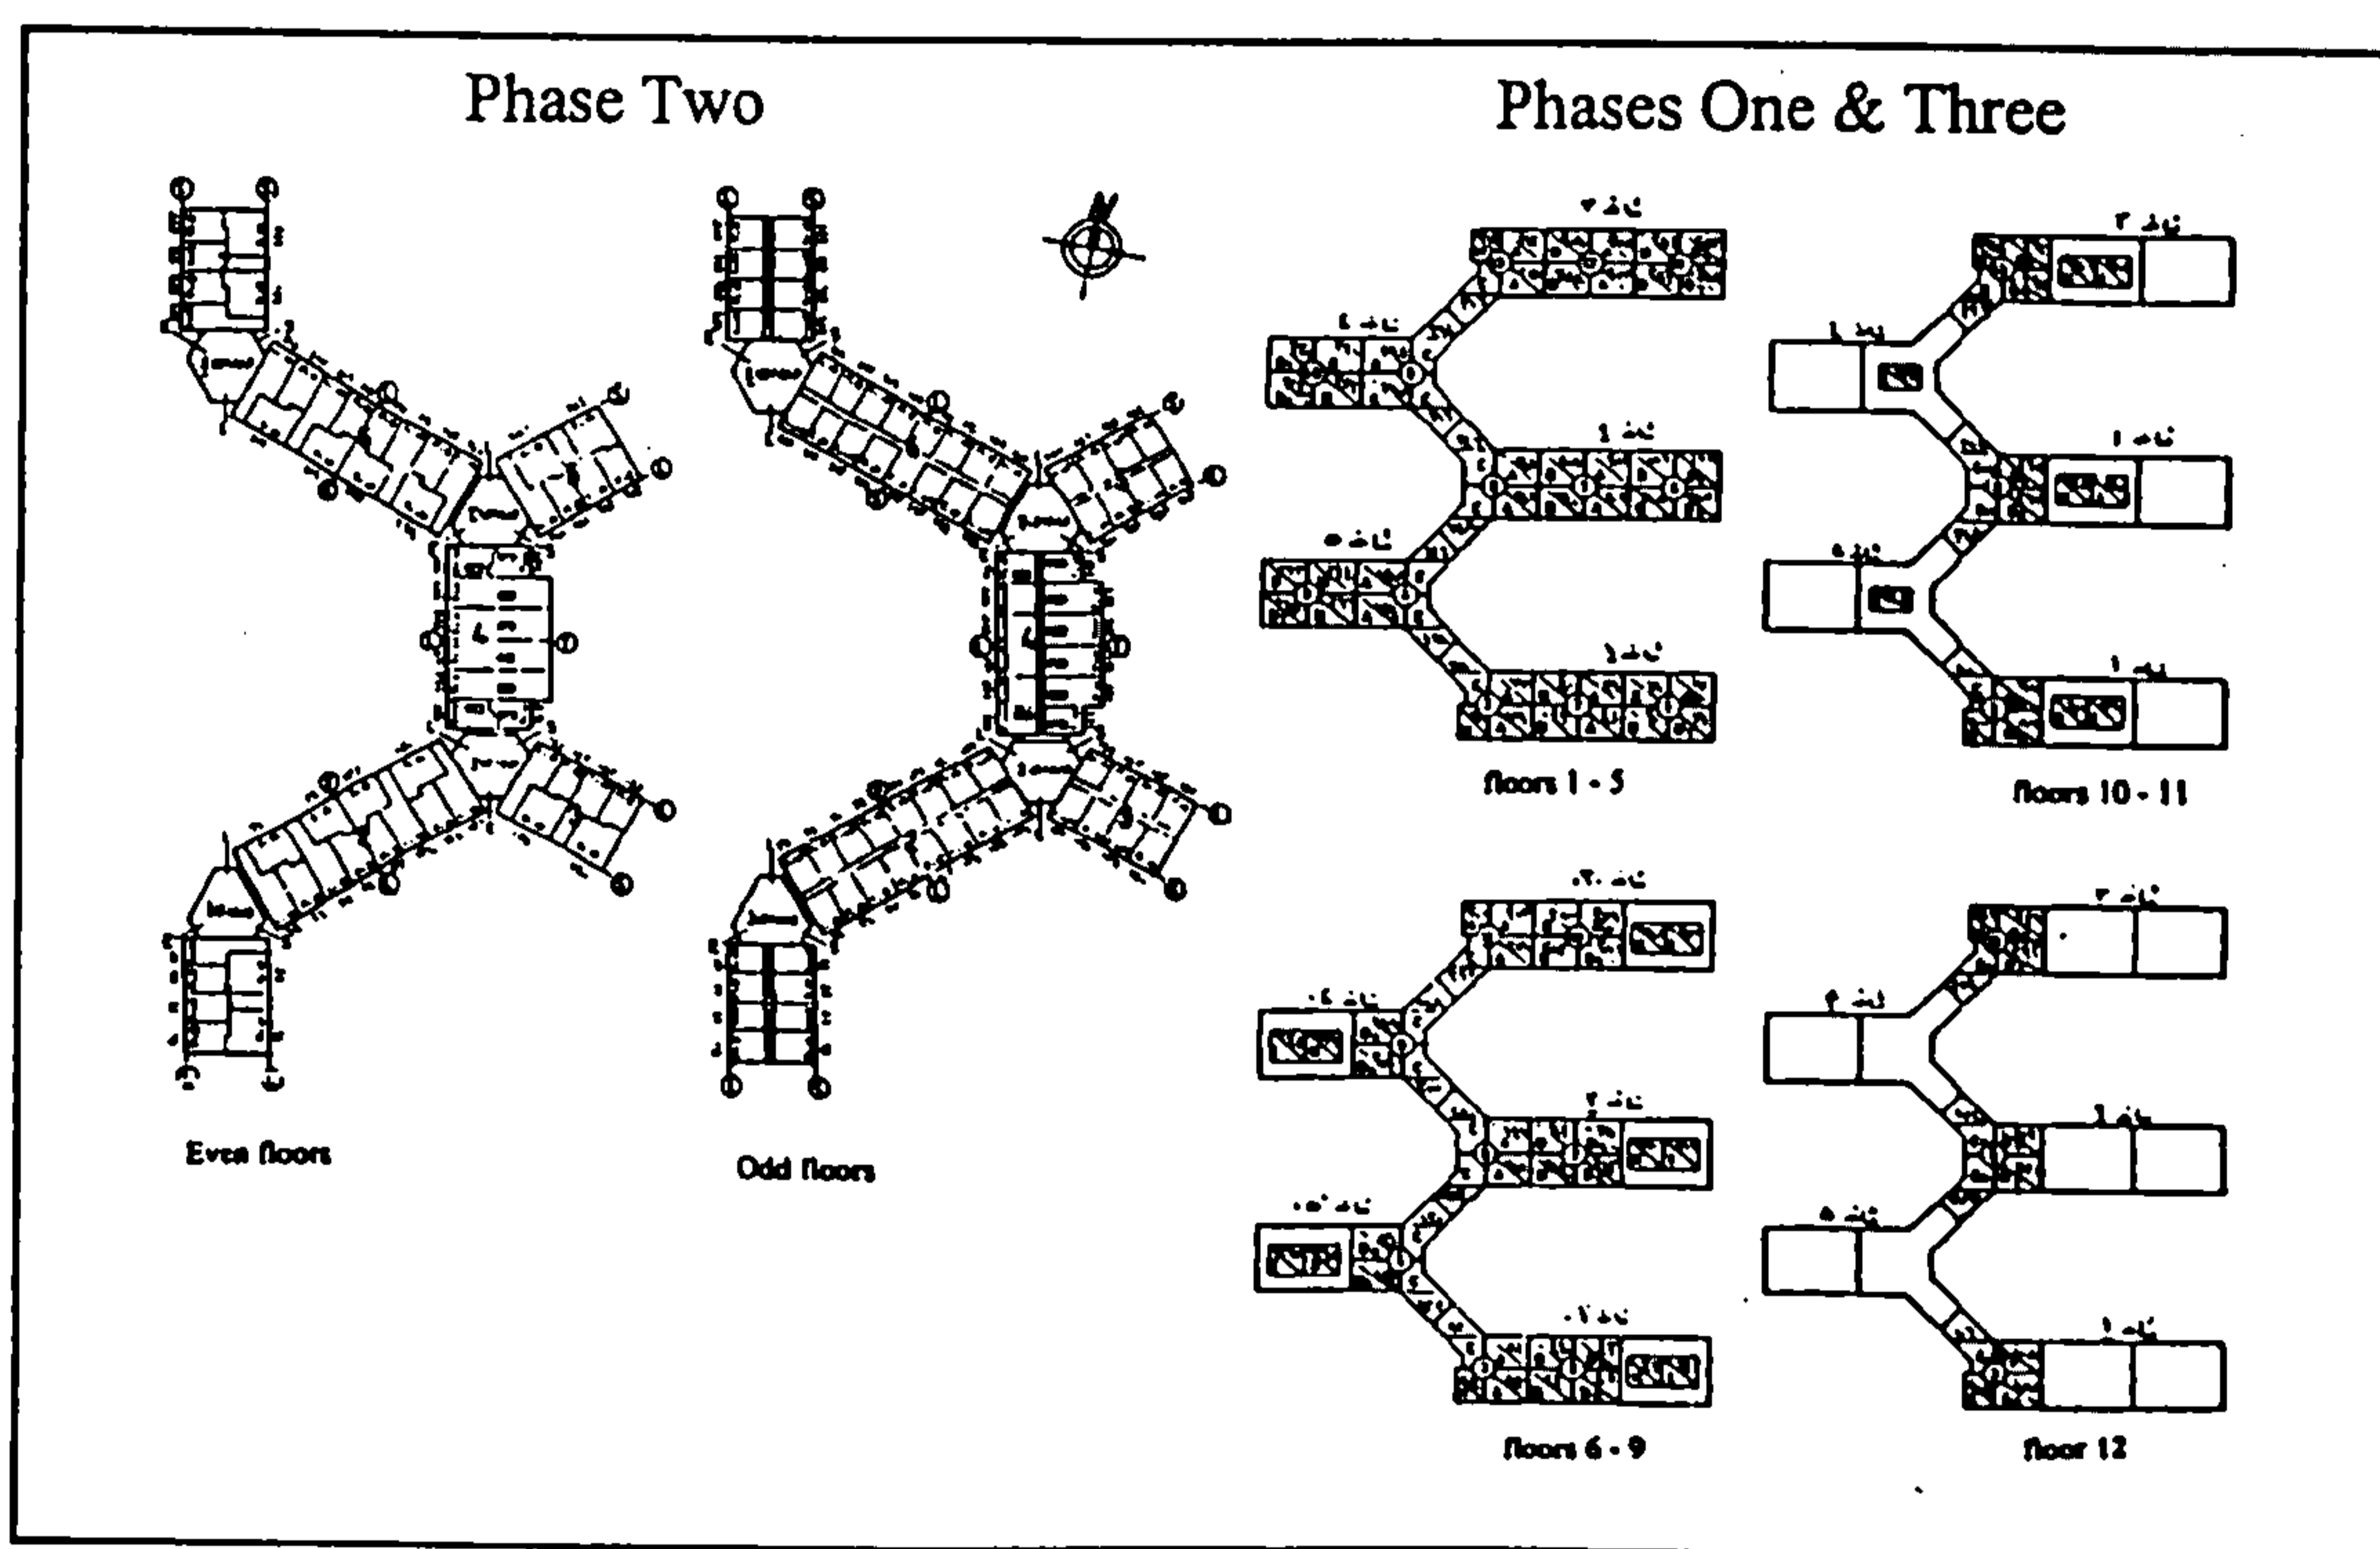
Types of Floor Plans of Ekbatan Neighbourhood.
